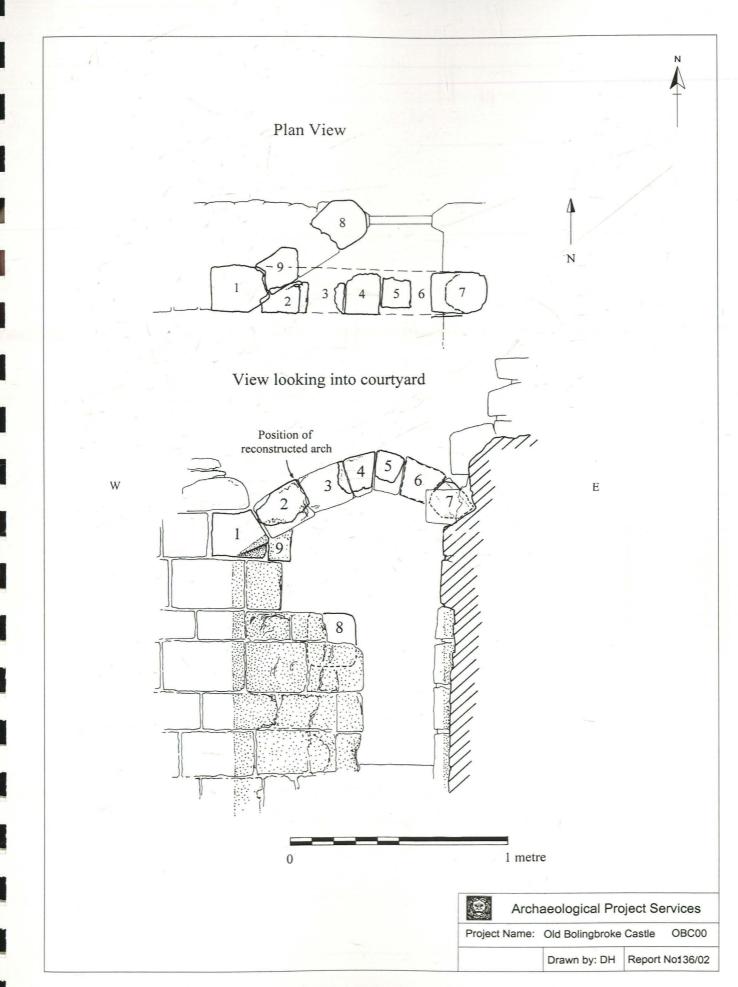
Internal Elevation of South Tower, showing approximate original positions of displaced stones, and schematic plan of window
